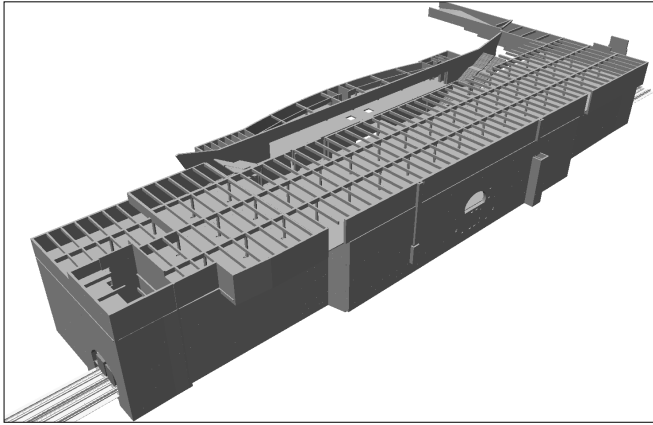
Subway Station, finishing construction works become “hidden” by the walls and slabs
